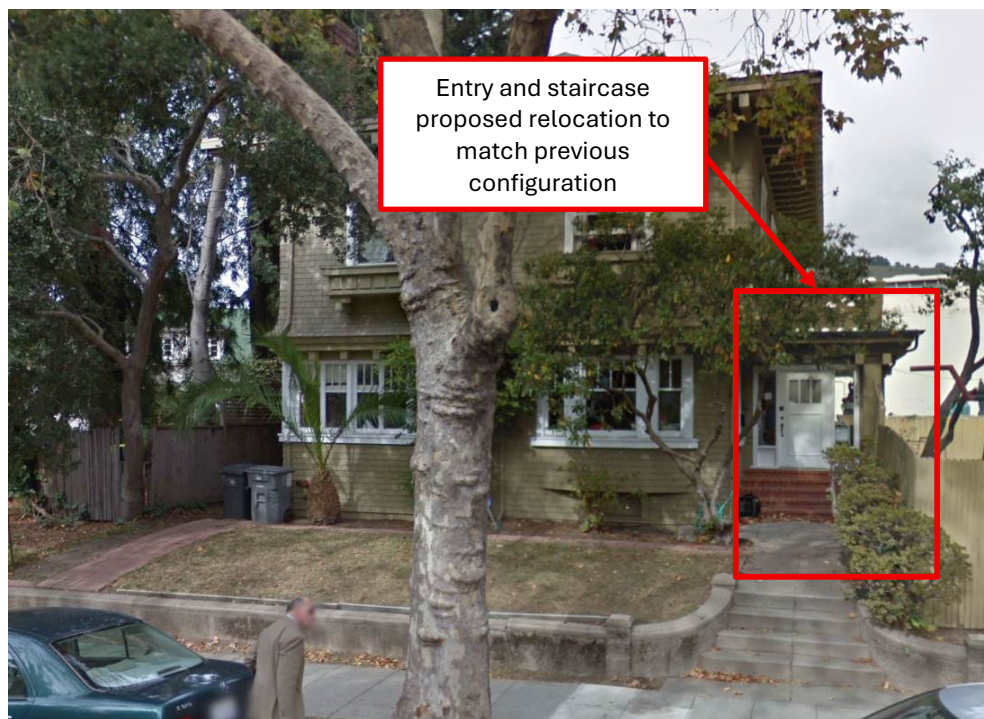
Subject Property, south façade facing Woolsey Street, around the end of the nursery school use (Berkeley Architectural Heritage Association, SAP application packet, c. 2000s)
